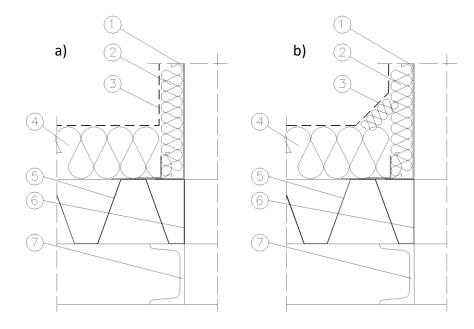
ITEM B: Standard base on steel structure (a - PVC membrane, b - roofing paper).
